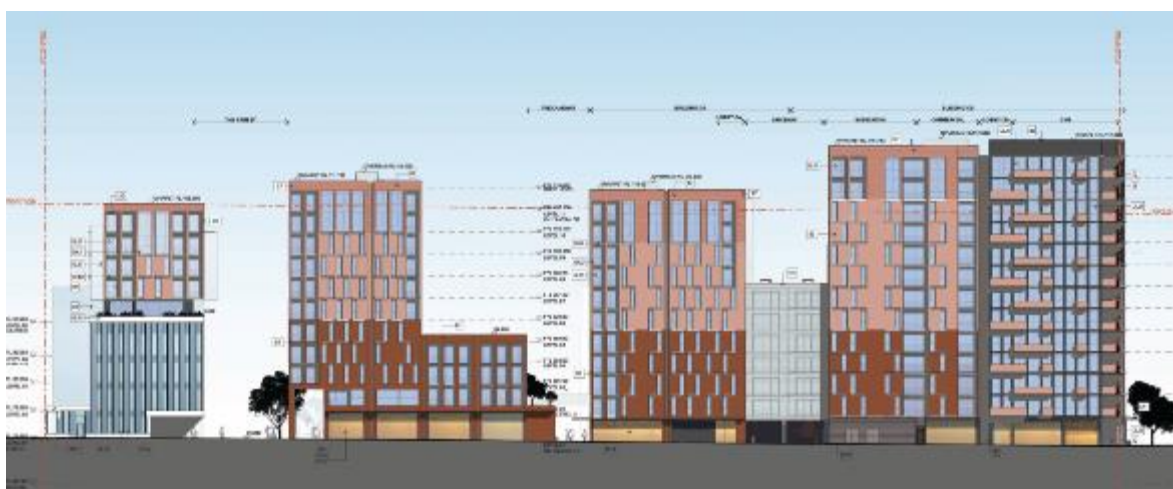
Rutledge Street Elevation (Plan 1502, Revision 2)
